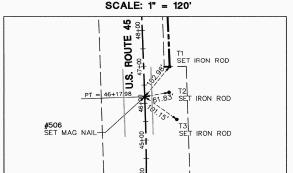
DETAIL OF POINT NO. 502 SCALE: 1" = 120'
